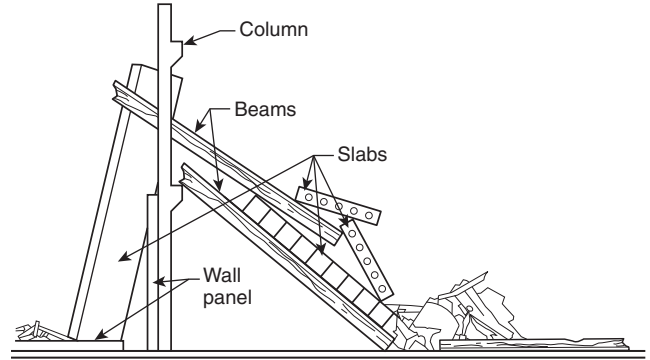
(g) Random Fall Collapse Pattern — Precast Concrete Construction.
